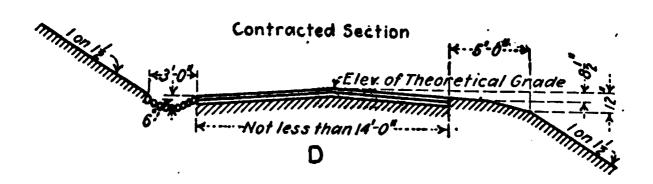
NEW YORK STATE 1915 STANDARDS. Cement Concrete
